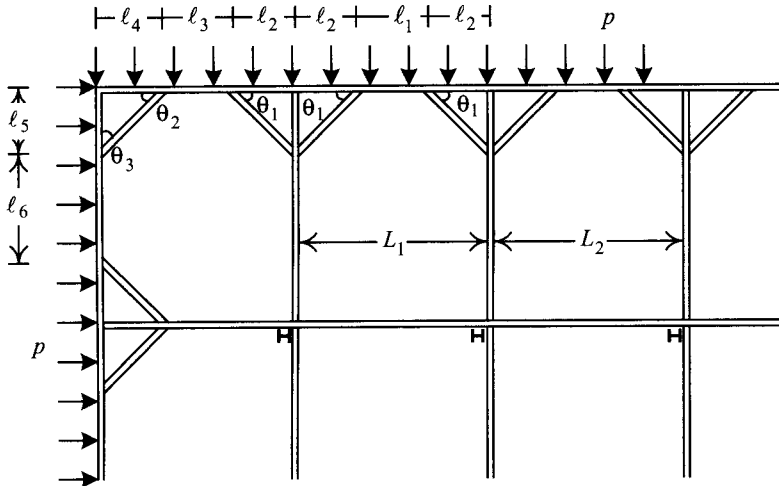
Distance and angle between struts and end braces or corner braces.
